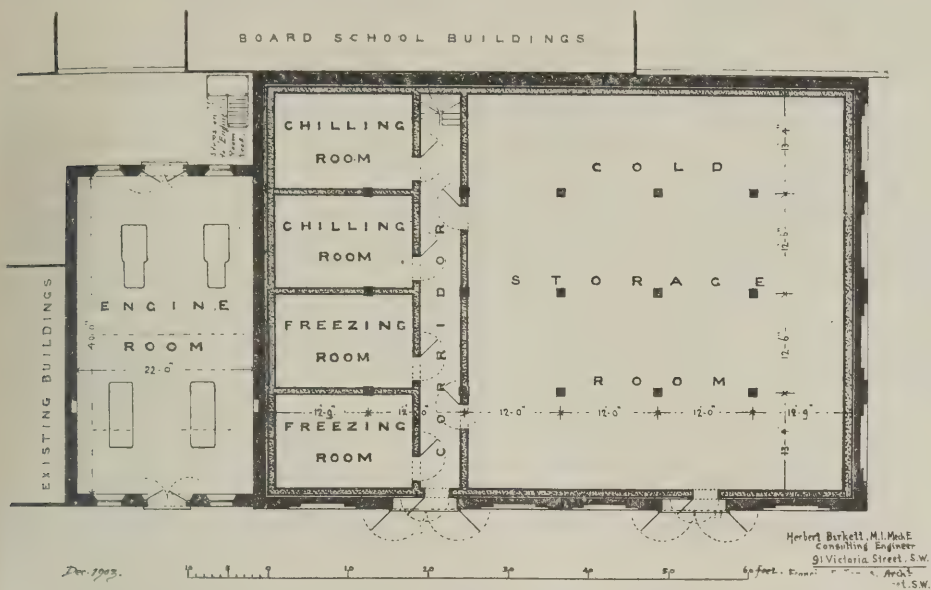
GALLEY WALL ROAD REFRIGERATING WORKS. GROUND PLAN.
